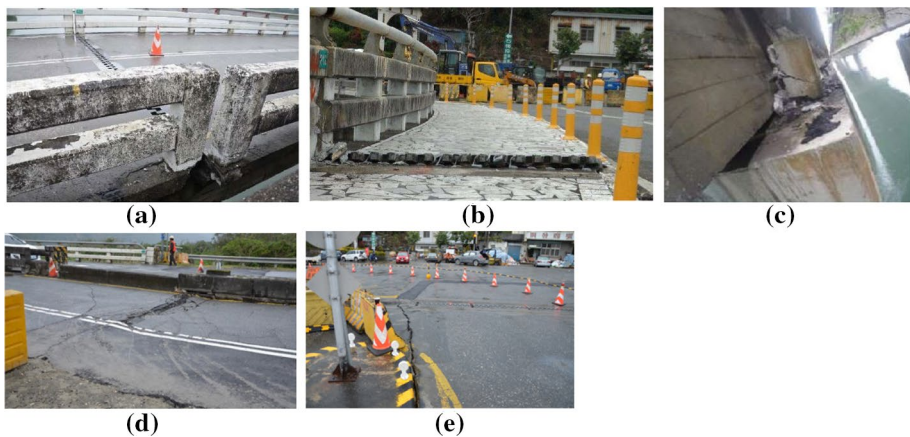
a Southbound route at pier P12. b Northbound route at pier P12. c Cracked seismic stopper at pier P12. d Upheaval of road surface near abutment A1. e Cracked road surface near abutment A2
